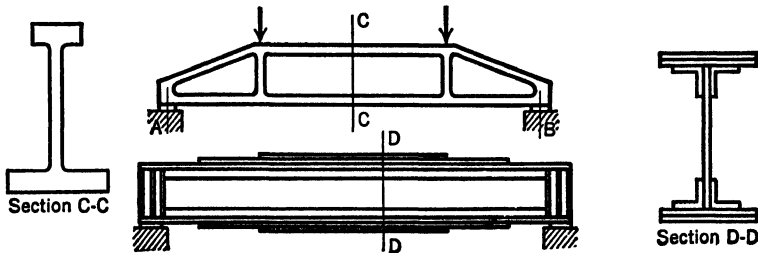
Cast beam and built-up beam (plate girder) of variable cross-section.
